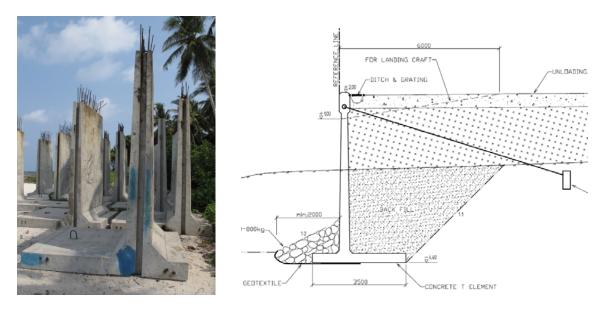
Image Concrete T-Blocks (3.7 m x 2.6 m) available from Works Cooperation (left) and how the block fits to a typical quay-wall construction with reinforcements with rubble mound foot and geotextile lining.
